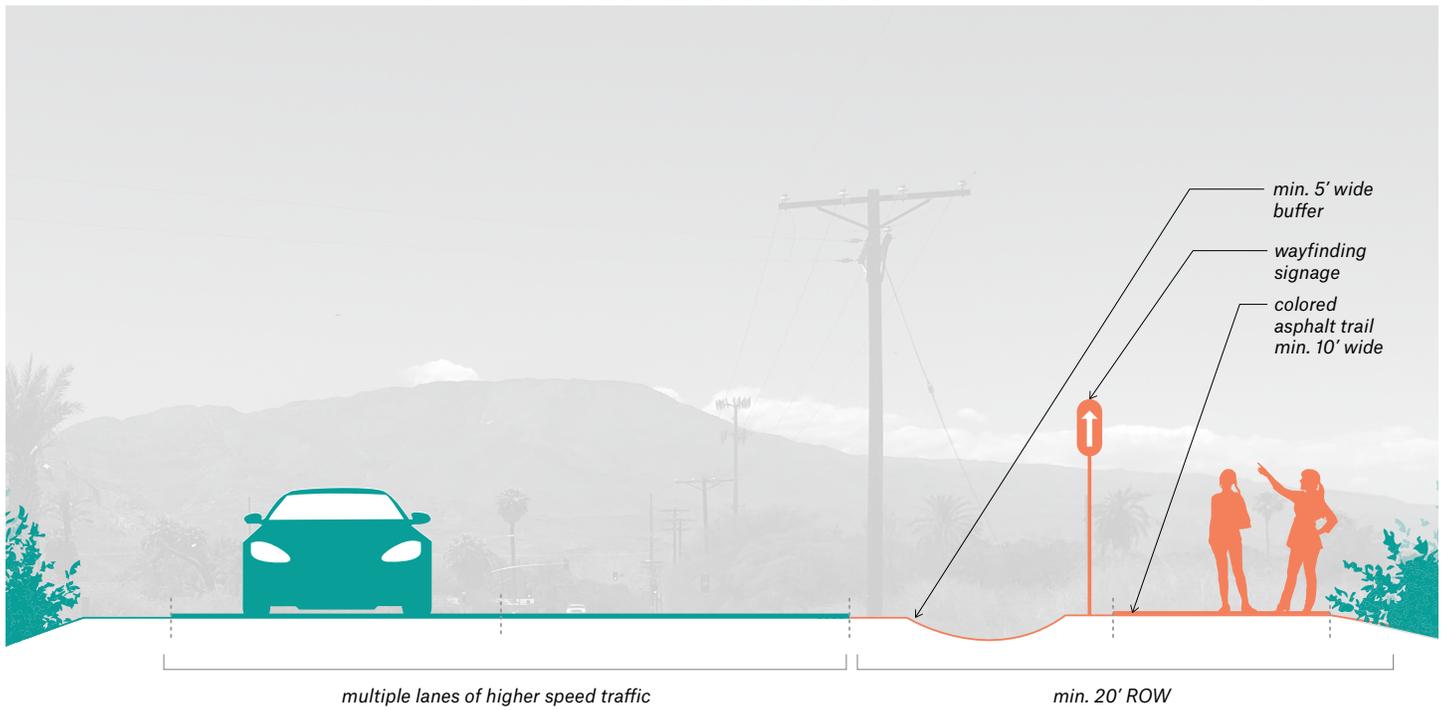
Typical Cross-Section: 10-foot Wide Class I Multimodal Path
